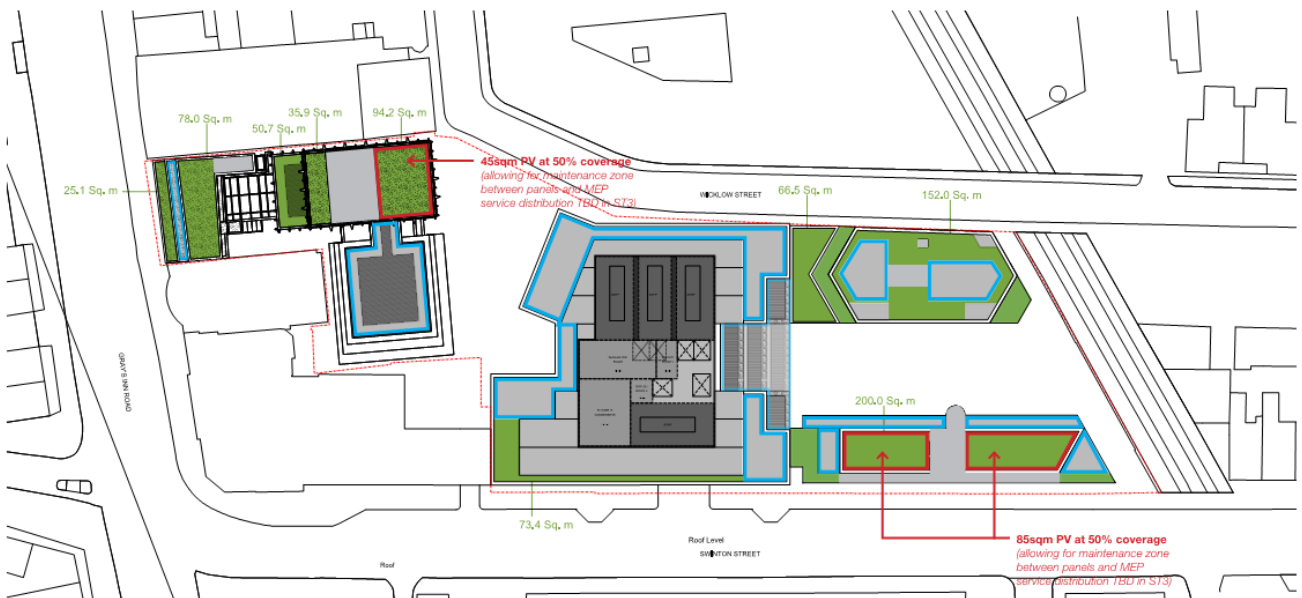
Proposed PV layout for the proposed development (Roof strategy sketch by AHMM).
